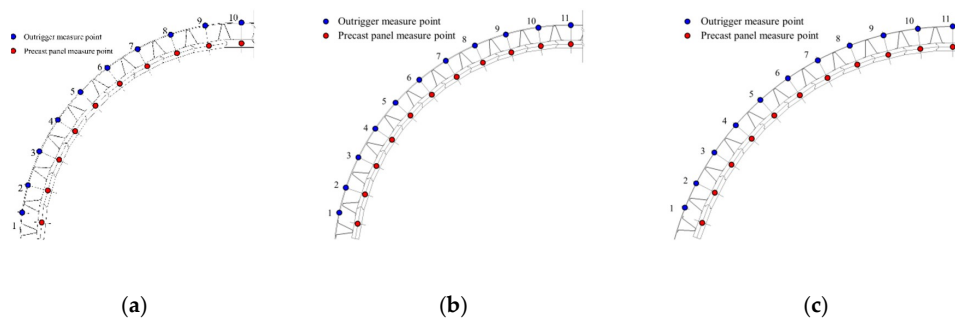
Confirmed positions from member-unit structural analysis of outrigger and precast panel: (a) 6 m arch; (b) 7 m arch; (c) 8 m arch.
